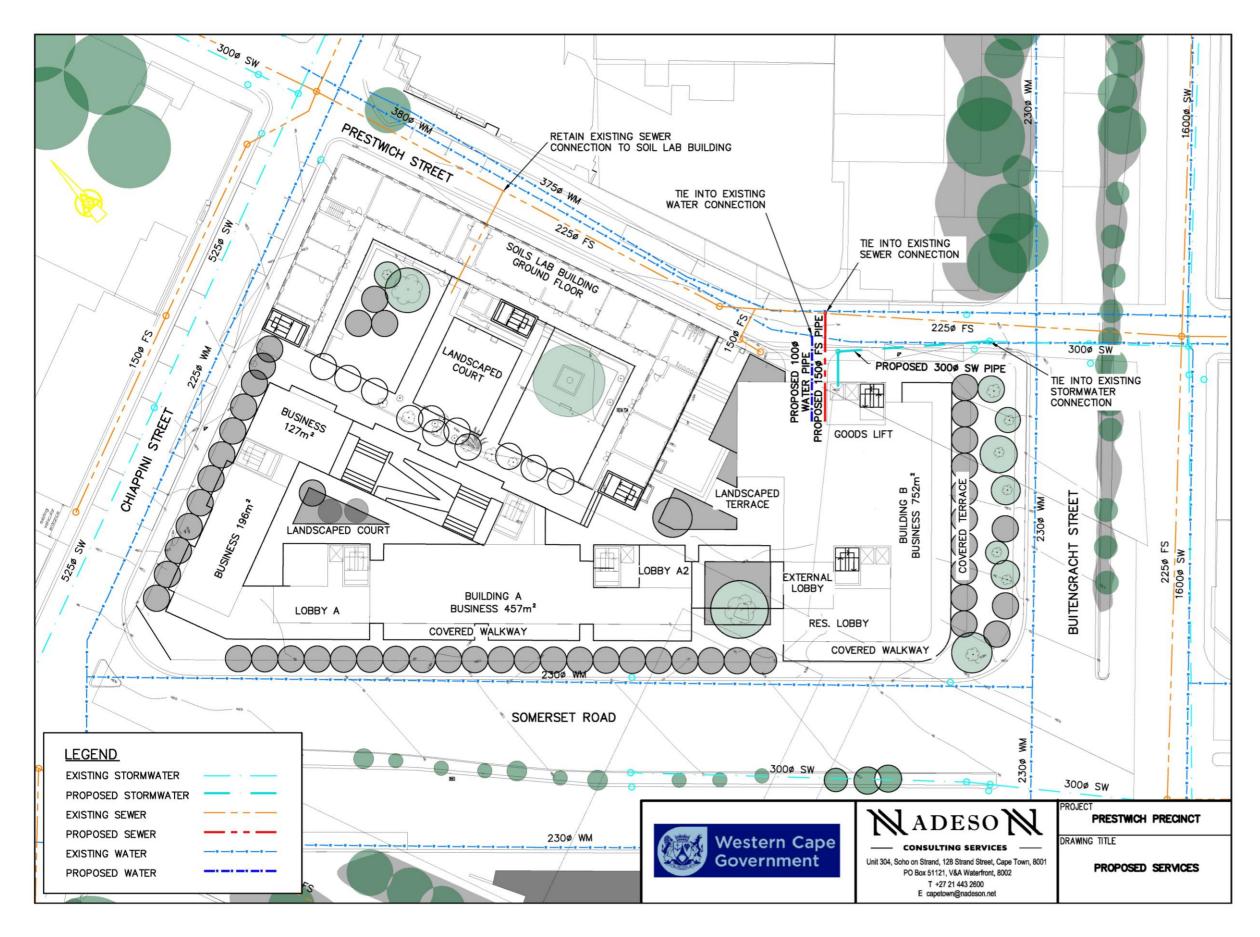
Proposed civil engineering services plan (Source: Nadeson, 2023)
